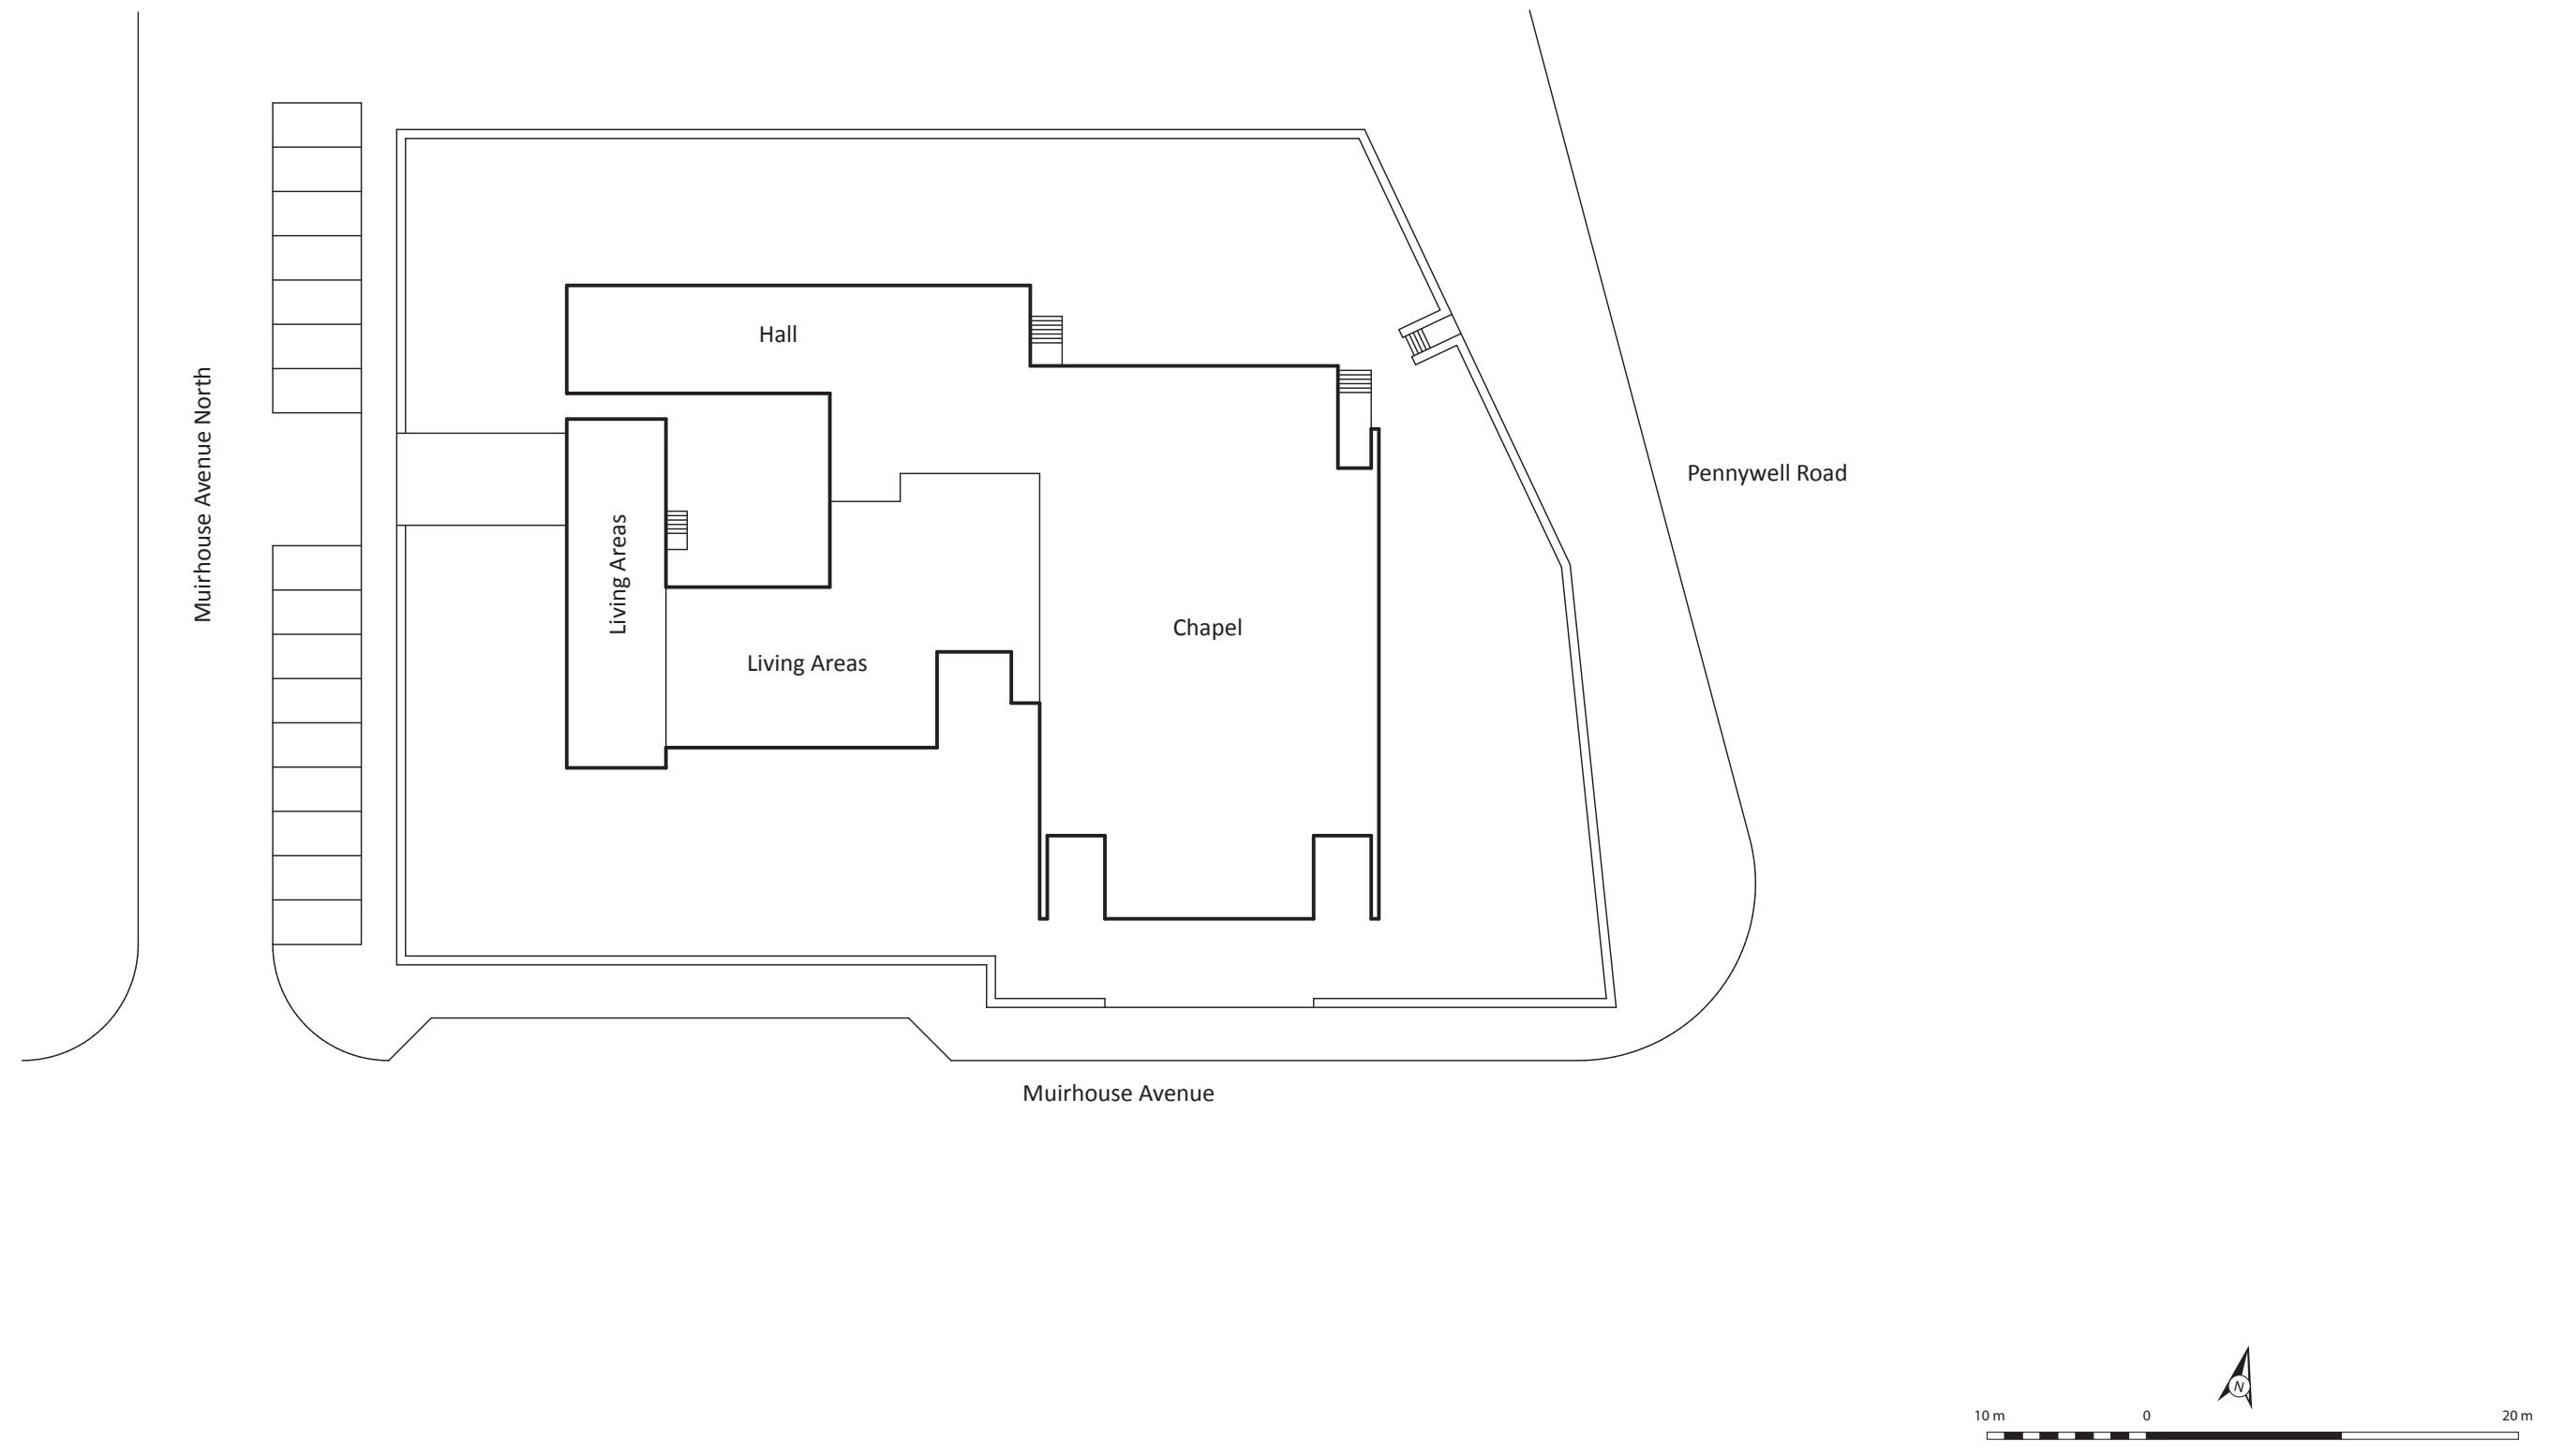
St Paul's Church, site plan (provided by client, Robert Mackenzie)
